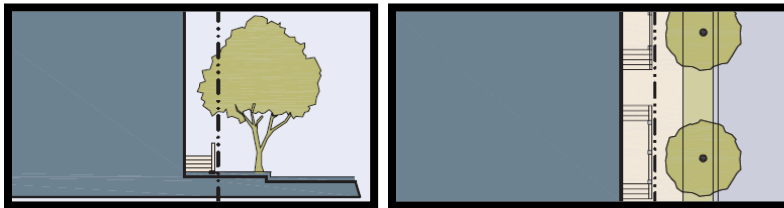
C. FORECOURT BUILDING FRONTAGE.
